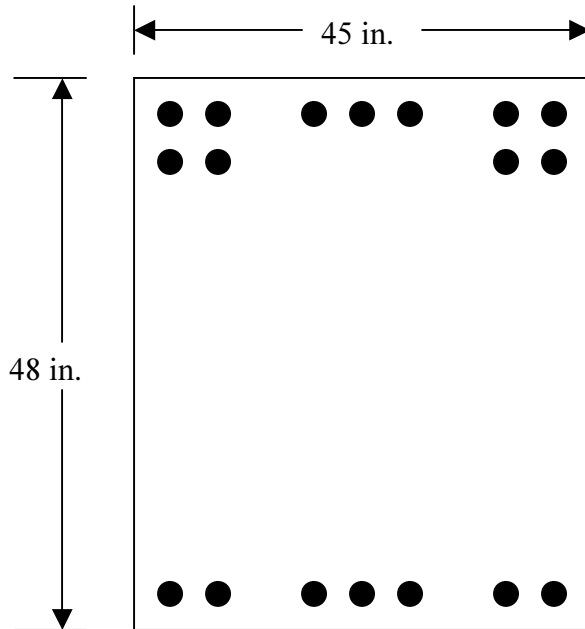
The simplified cross section of the West Bound bridge pier cap beam.
